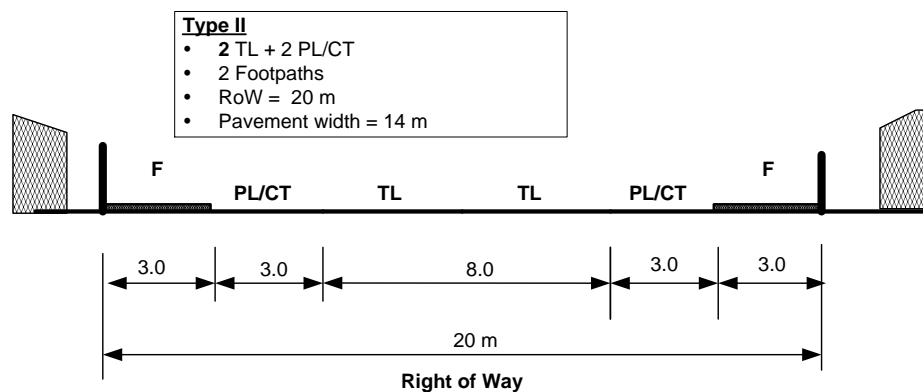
, Typical Cross-section for DCRN Roads (with RoW 20 m)
